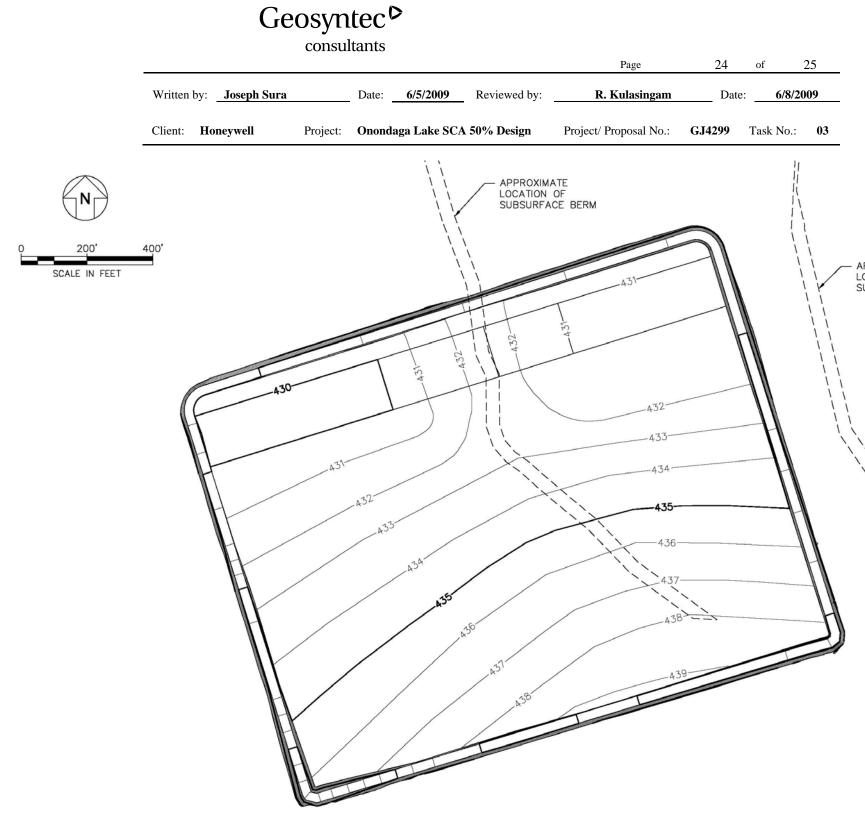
Proposed Gravel Drainage Layer Grading Plan for Option 2 (1.9 million cy)
